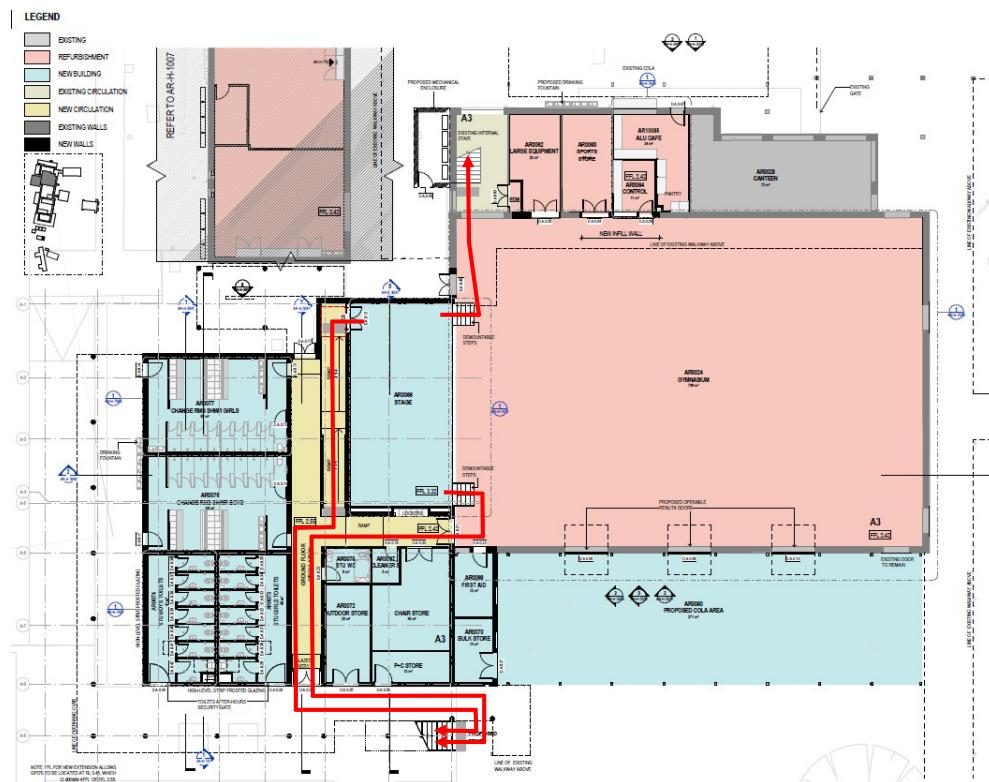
Access Routes from Stage 1 to Level 1 of Building A (refer red arrows)
